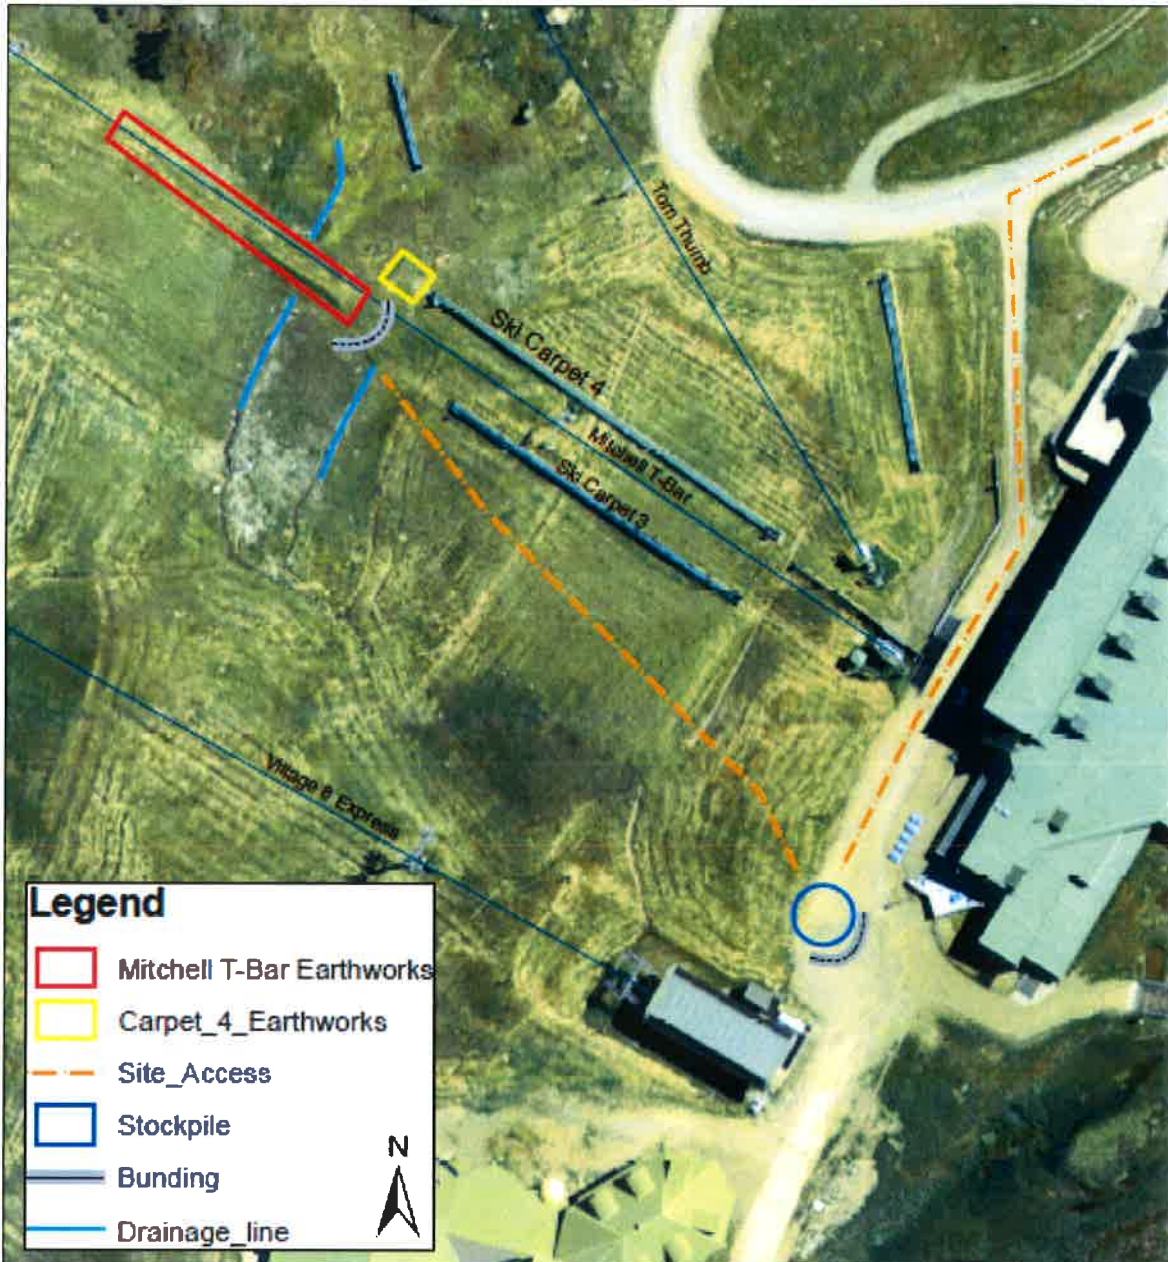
Proposed construction access (orange dotted lines) and stock piling / banded areas (Source: Applicants SEE)
